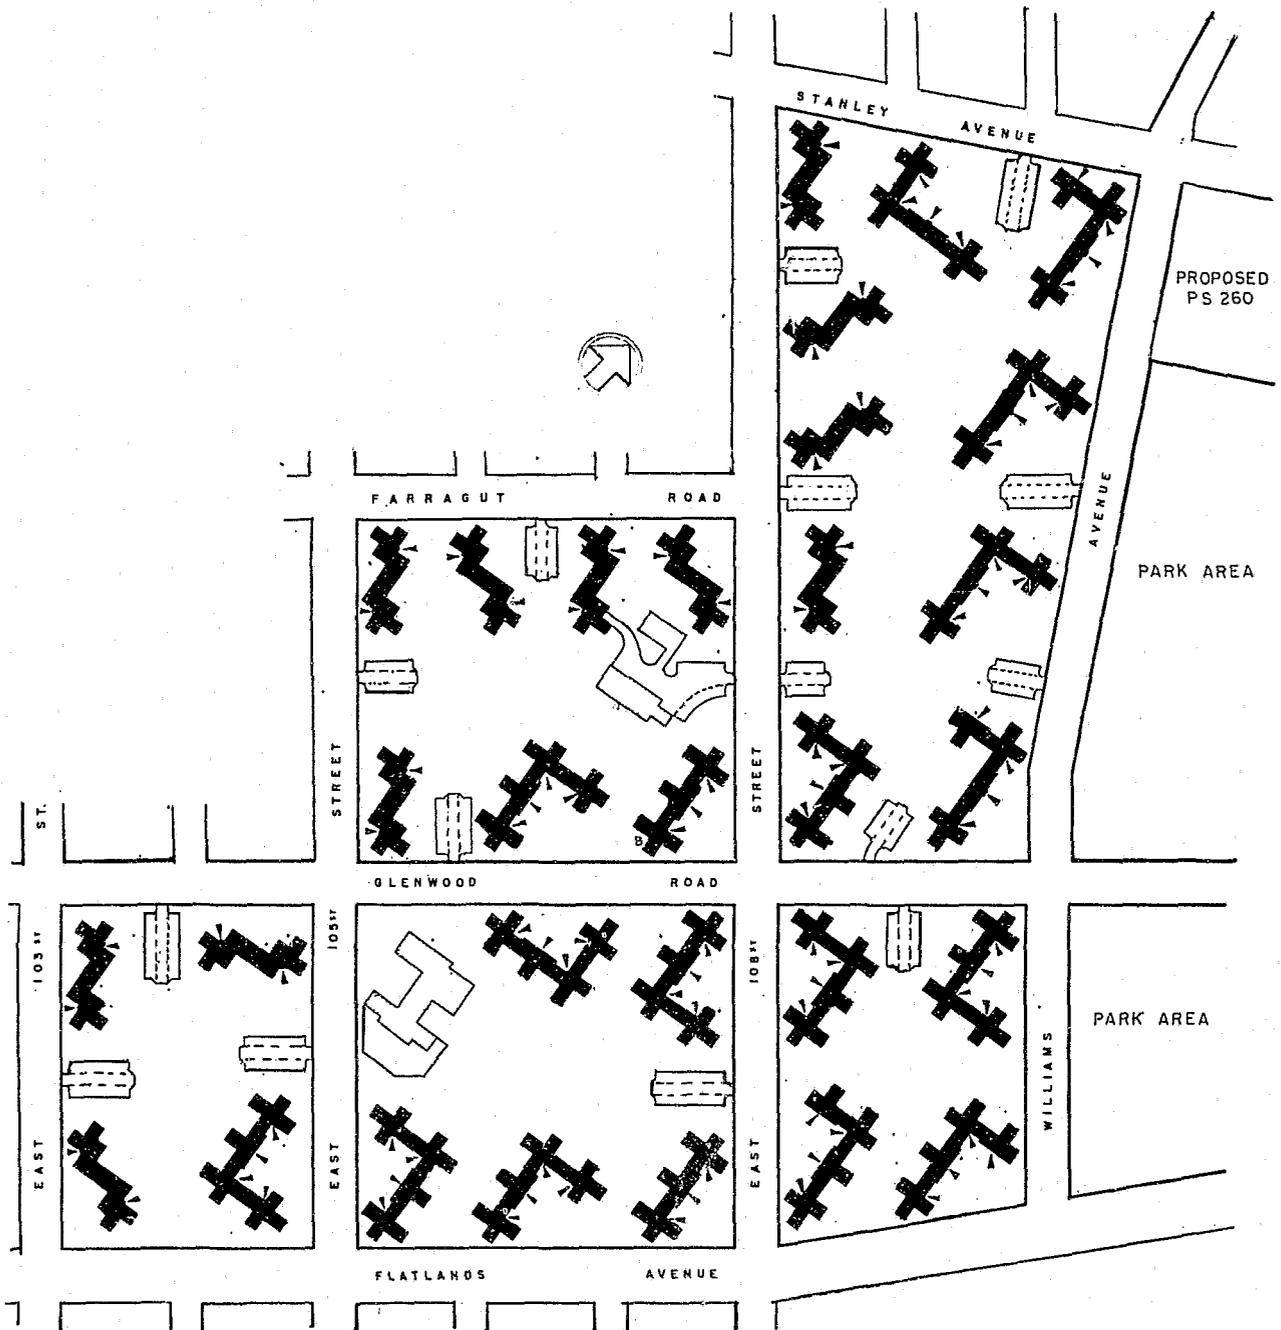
Breukelen Houses, New York. Site plan.
